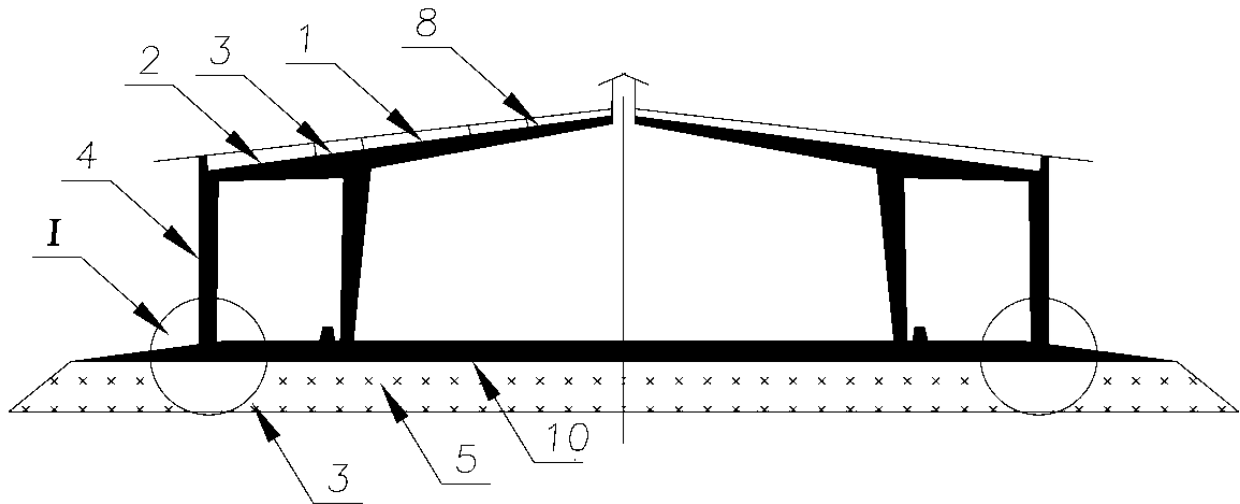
Three-hinged frame with balanced cantilevers:
